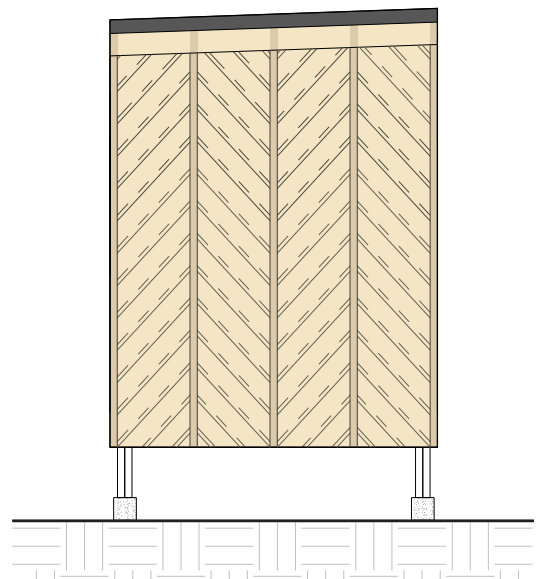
ELEVATION D-D PRIOR TO THE BUILT. SCALE 1:50
